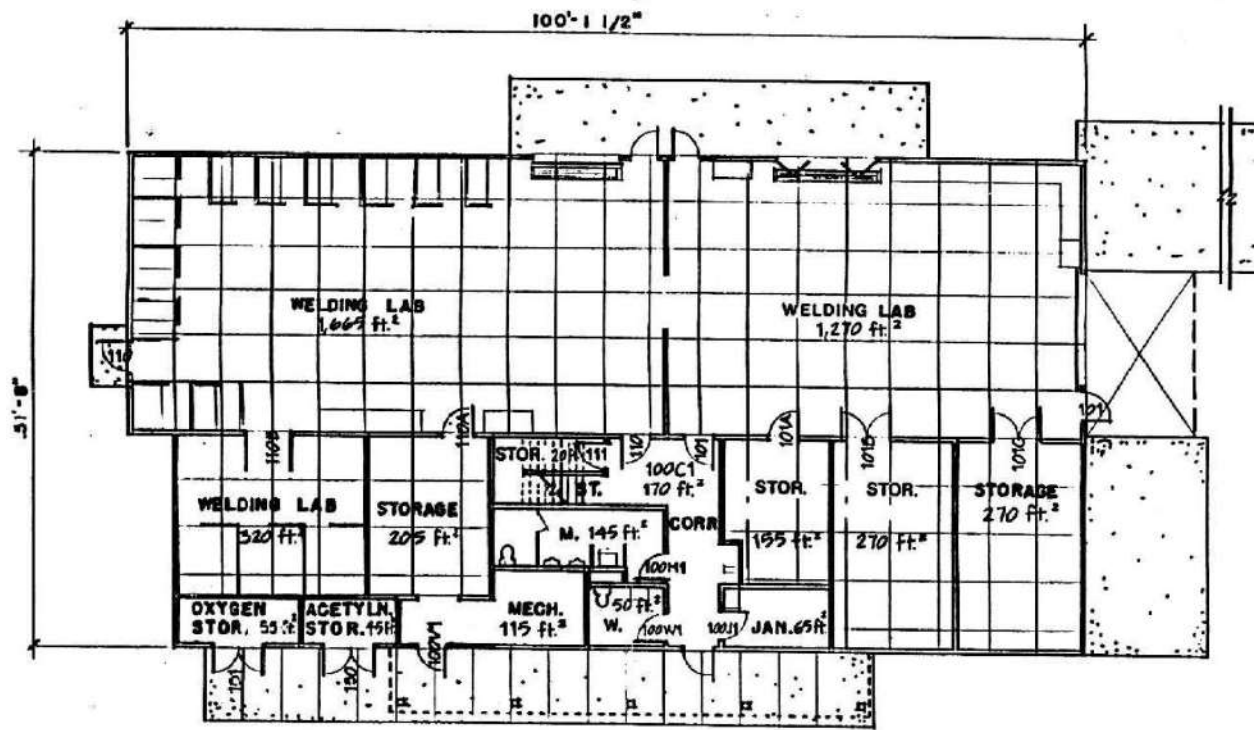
First floor layout of the Welding Lab
